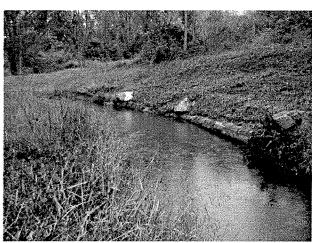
Looking downstream at rock cross vane installed at MS Station 44+38 and root wads/log toe protection. (4/7/04)
